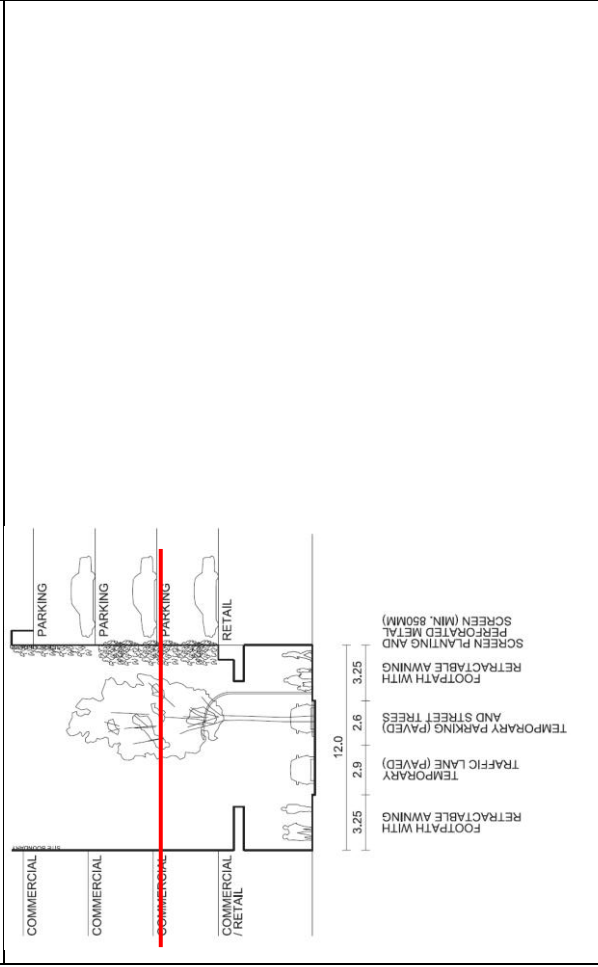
Local Street Type 3 Indicative Street Section – 12m (Section I)
